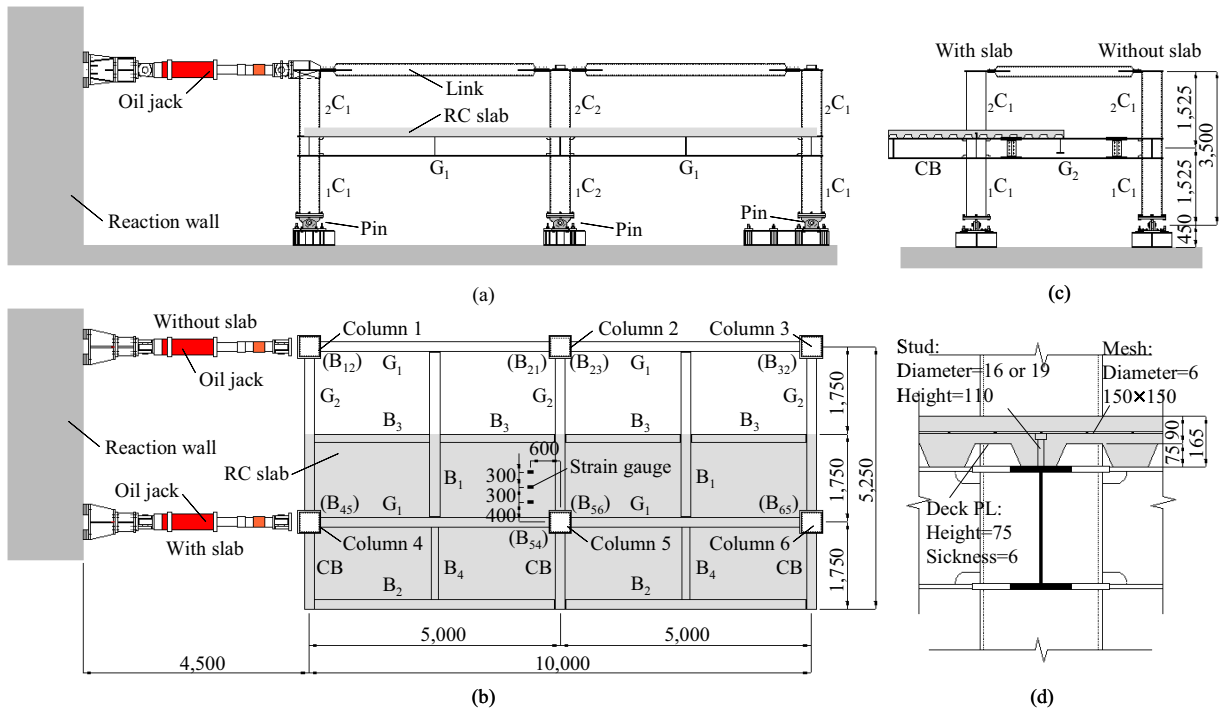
Test specimen: (a) South Elevation; (b) Plan (numbering of beam-ends shown in parentheses); (c) East elevation; (d) Profile of RC floor slab; (unit: mm)
